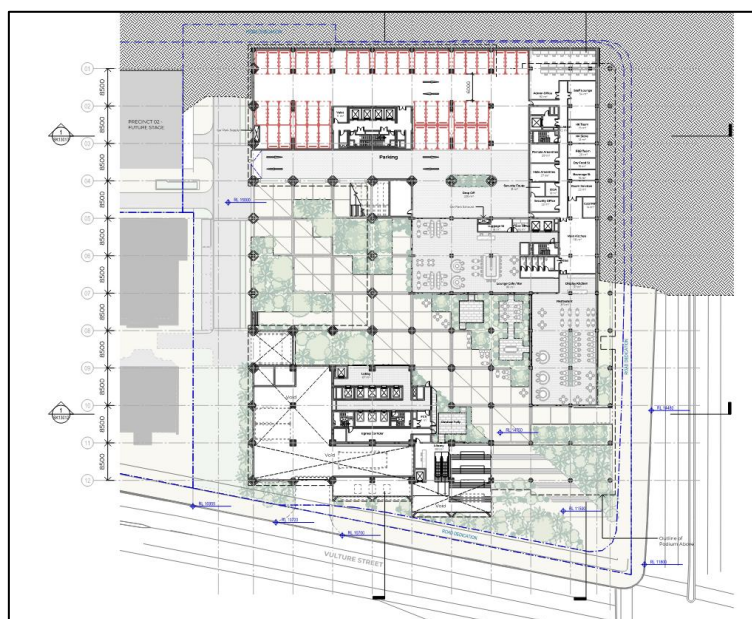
Proposed Precinct 1 (Source: Woods Bagot)
